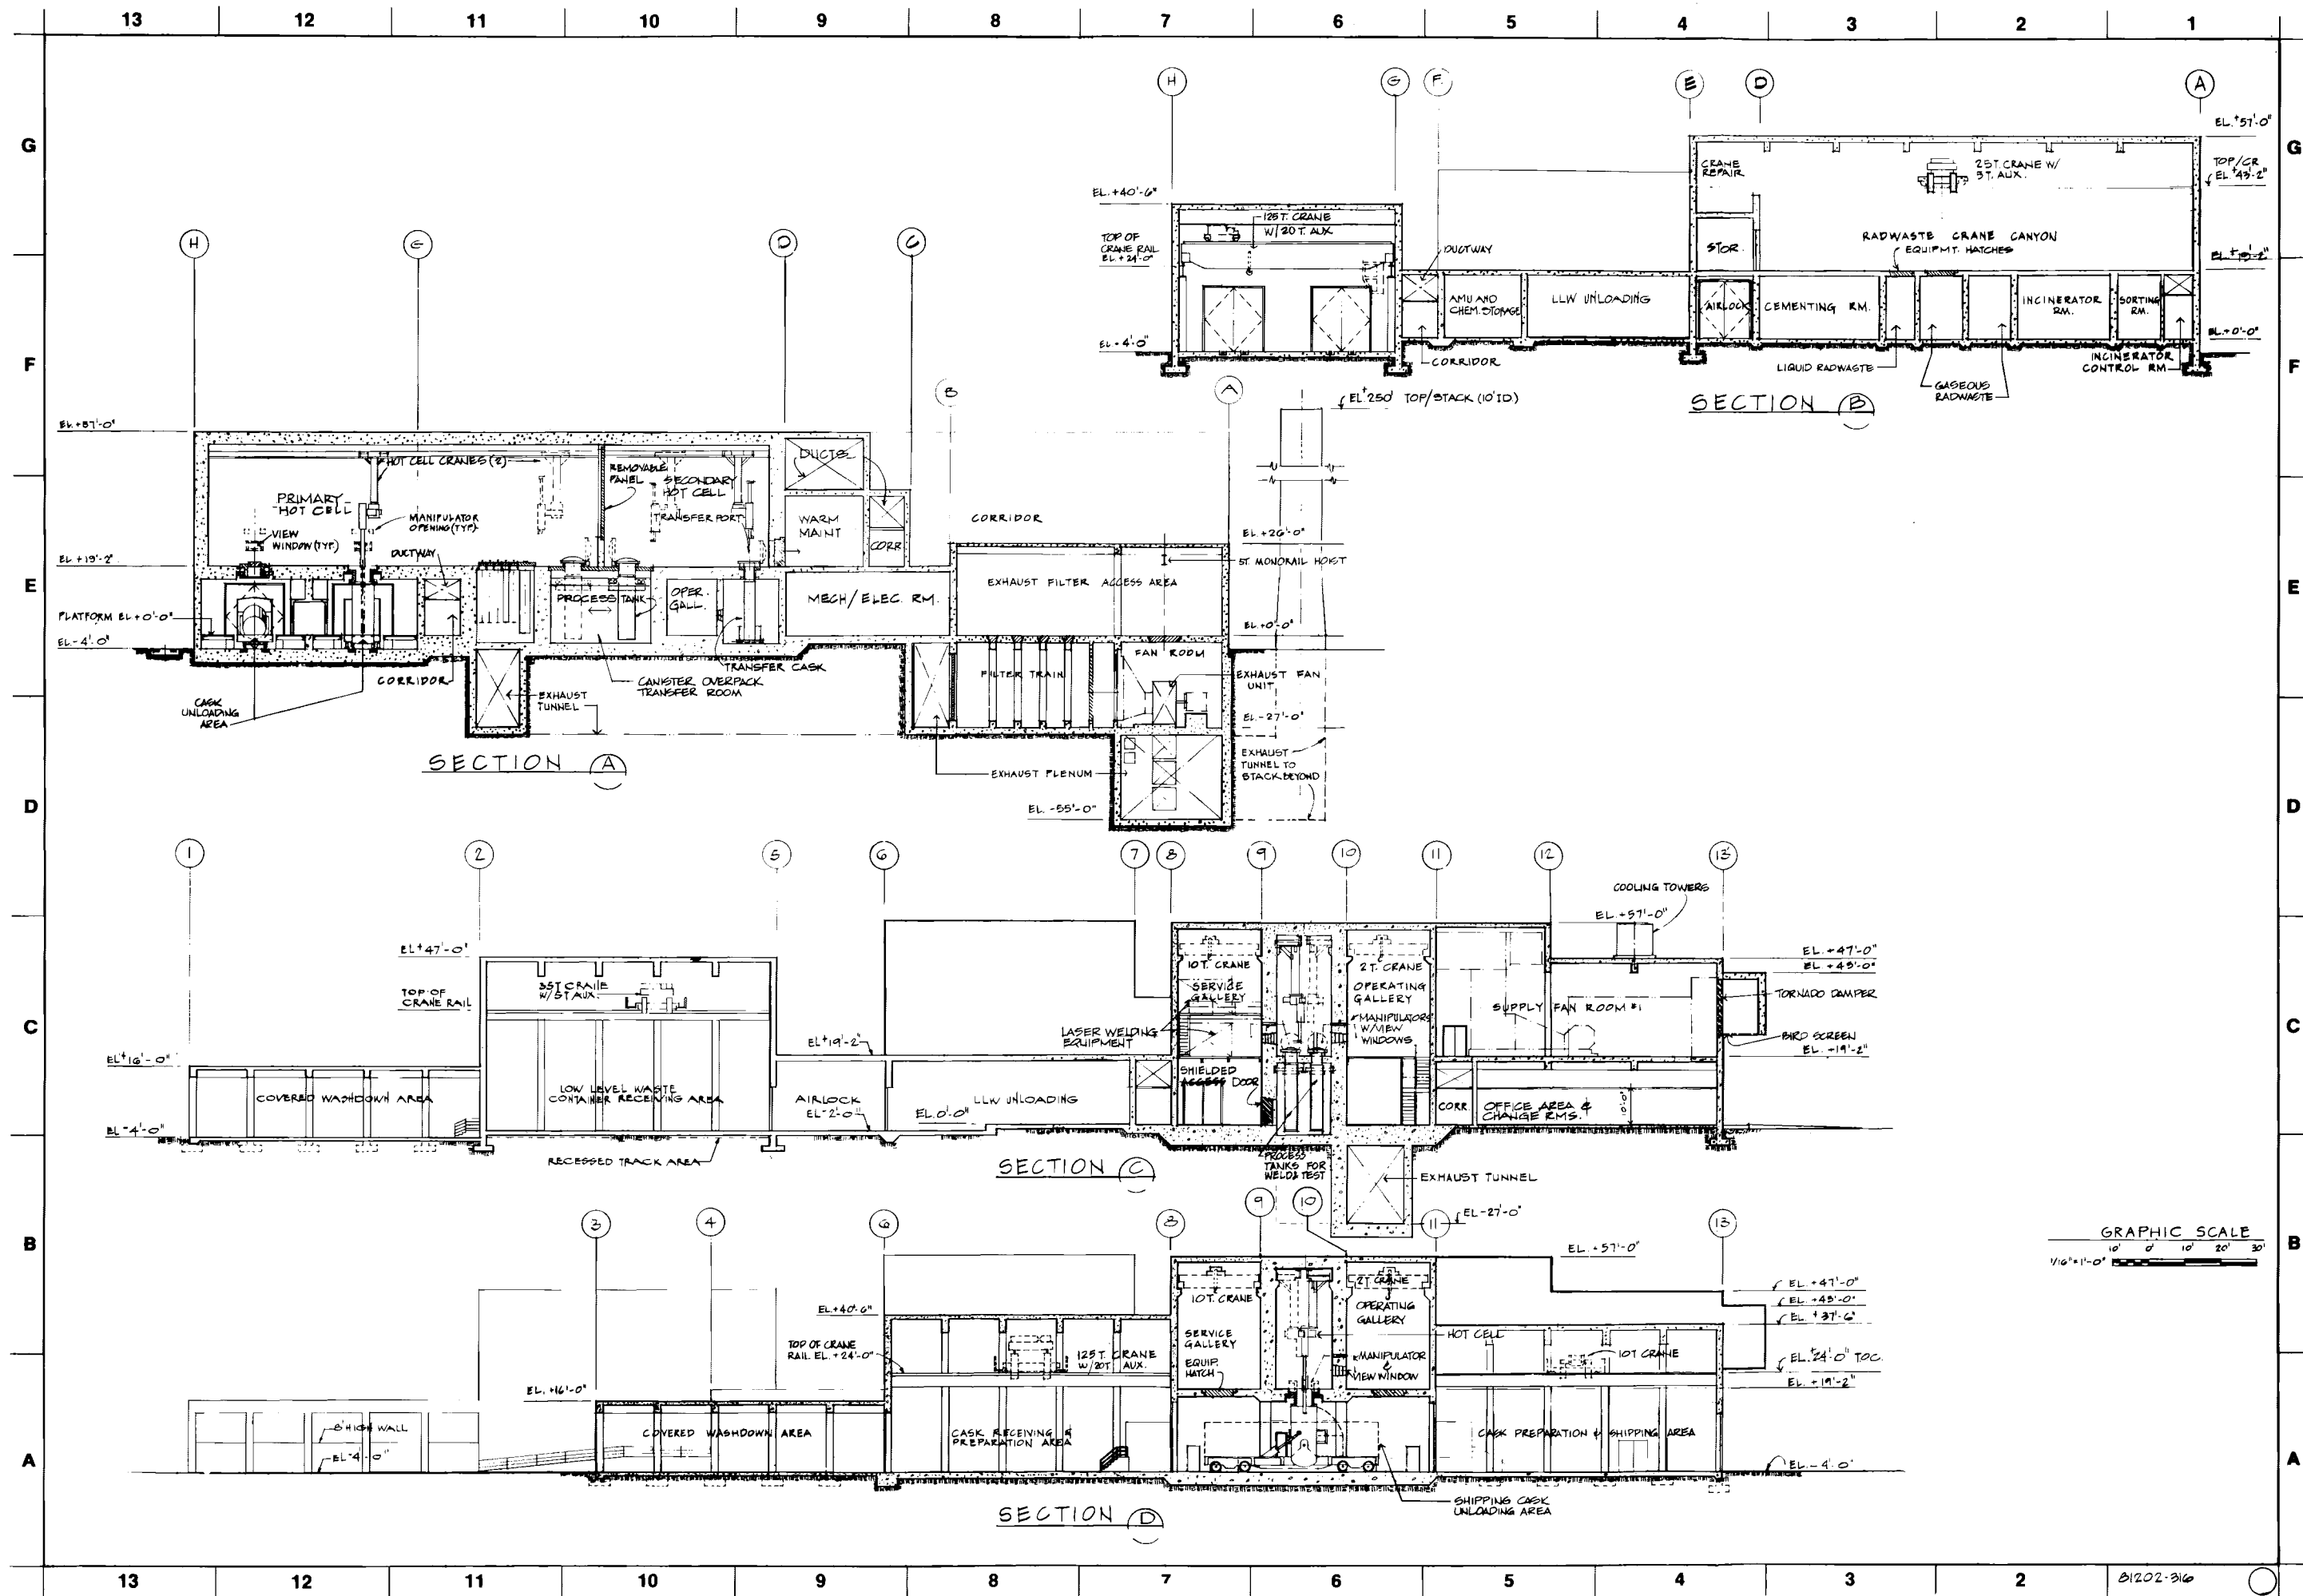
Waste Handling Facility - Sections and Elevations
